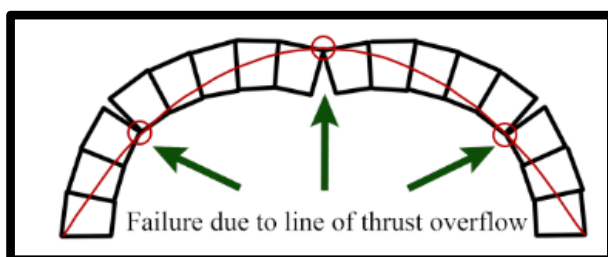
Failure in a masonry arch due to line of thrust overflow [77]
